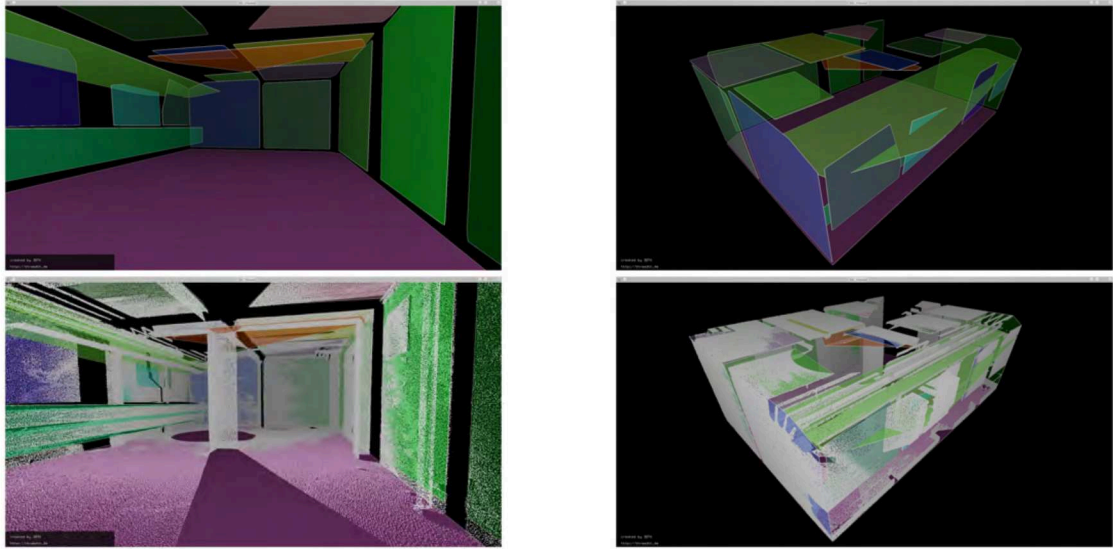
Extraction of planes for interior reconstruction. Adapted from [54]
